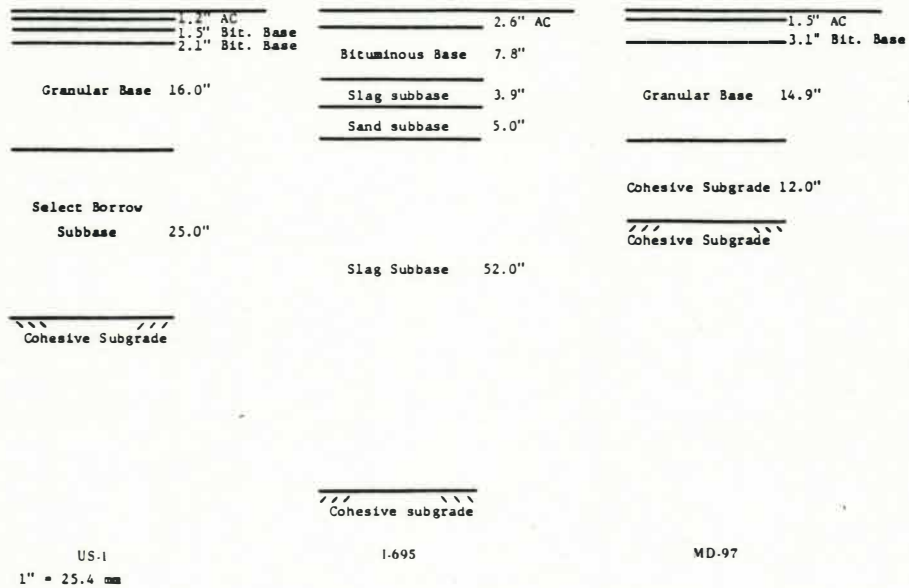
Average Cross-Sections of Maryland Pavement (May and Witczak <13>)
